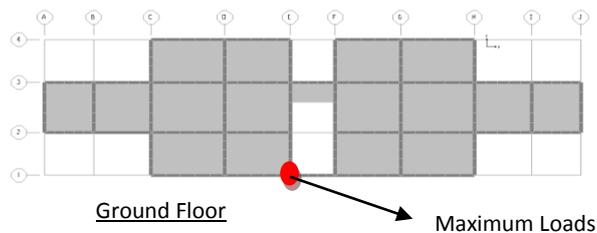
Plan of the Building showing the Column bearing the maximum Loads.
